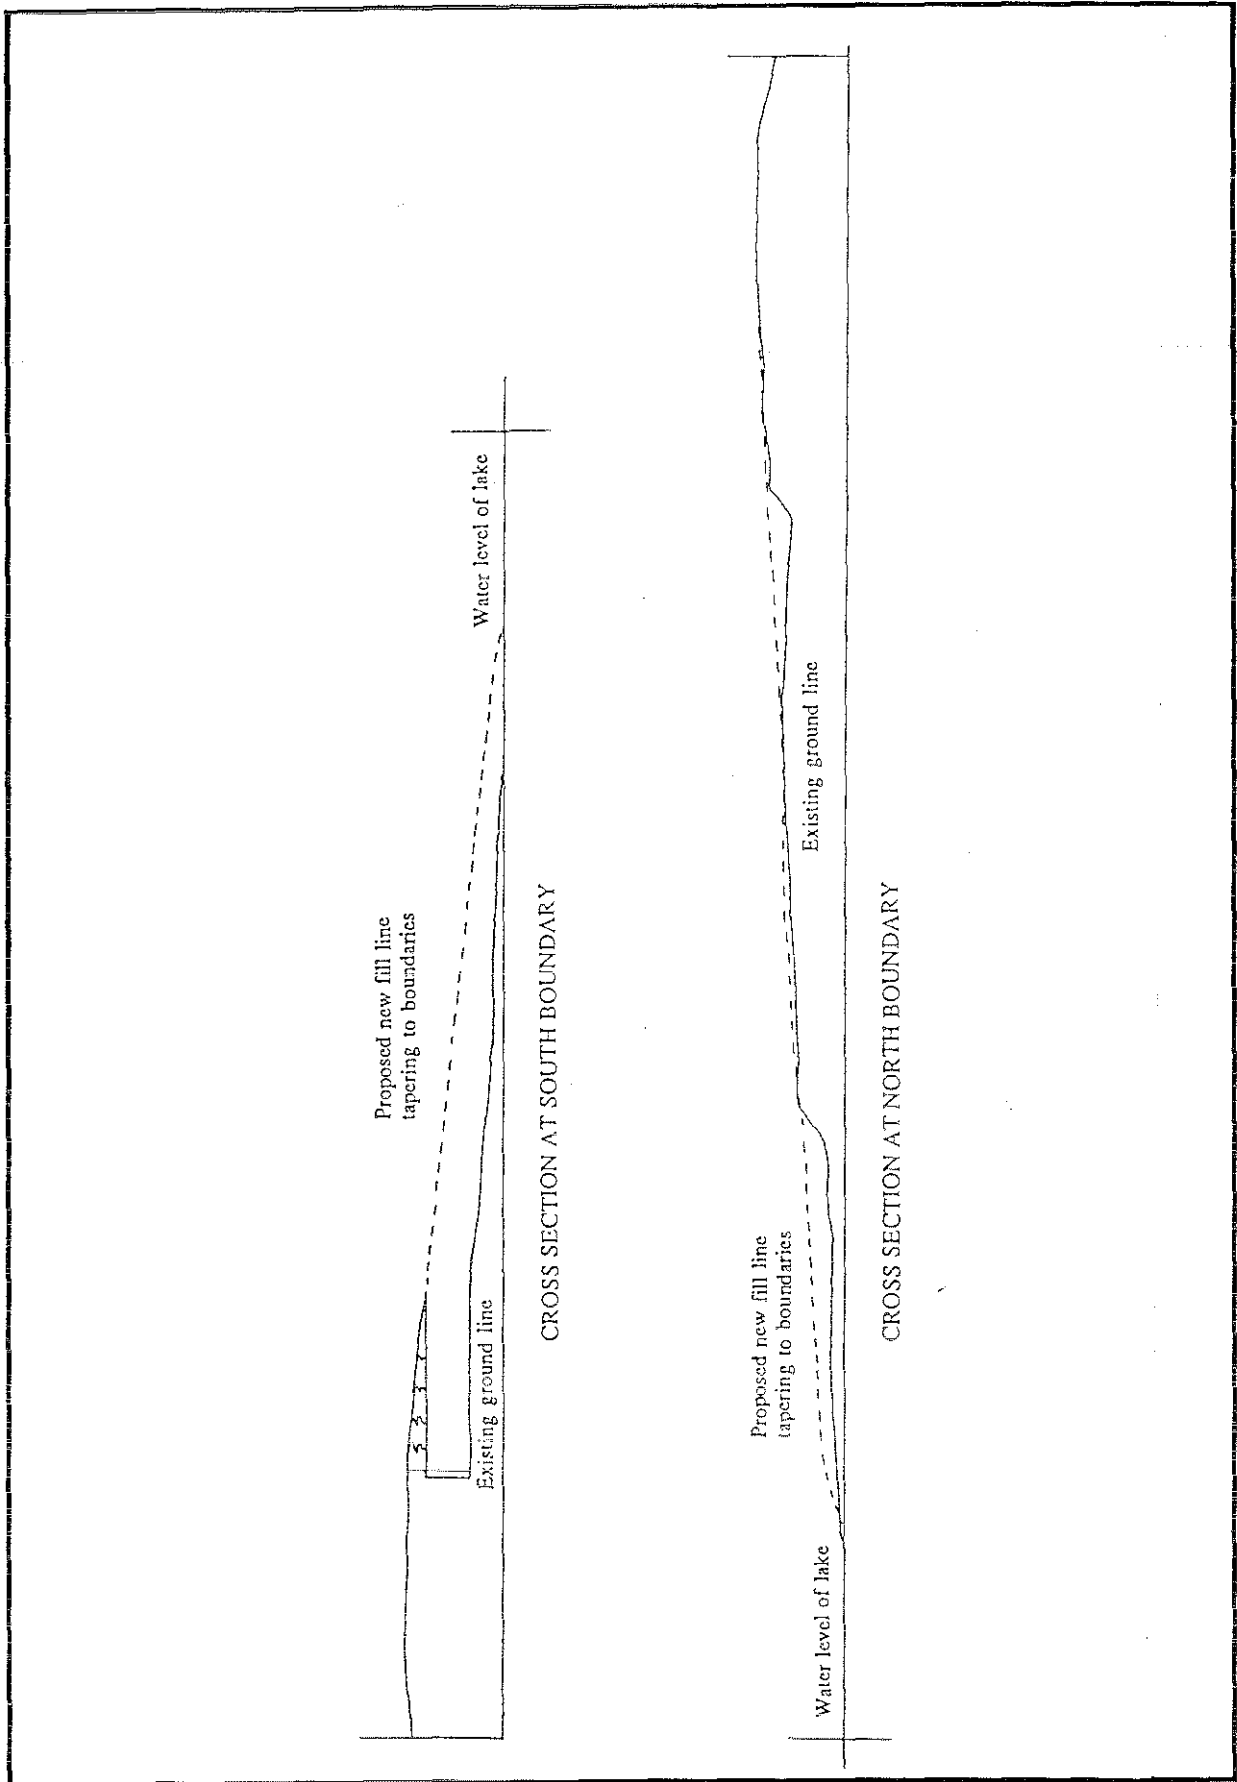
Proposed cross sections of final landform at north and south boundary of Lot 23 Fawcett Road, Munster
